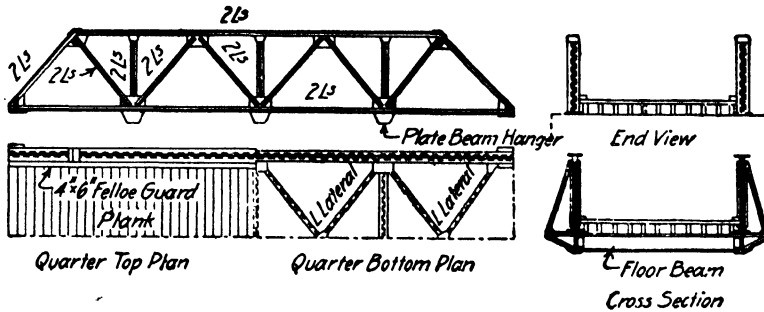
PLAN OF A LOW OR "PONY" TRUSS HIGHWAY BRIDGE.
